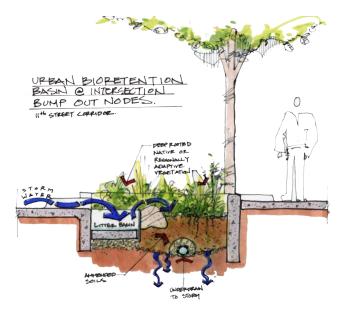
| This sketch of a green infrastructure solution was developed during the workshop to show how a bioswale planted with native plants can collect stormwater from the street and infiltrate it to the ground below.
